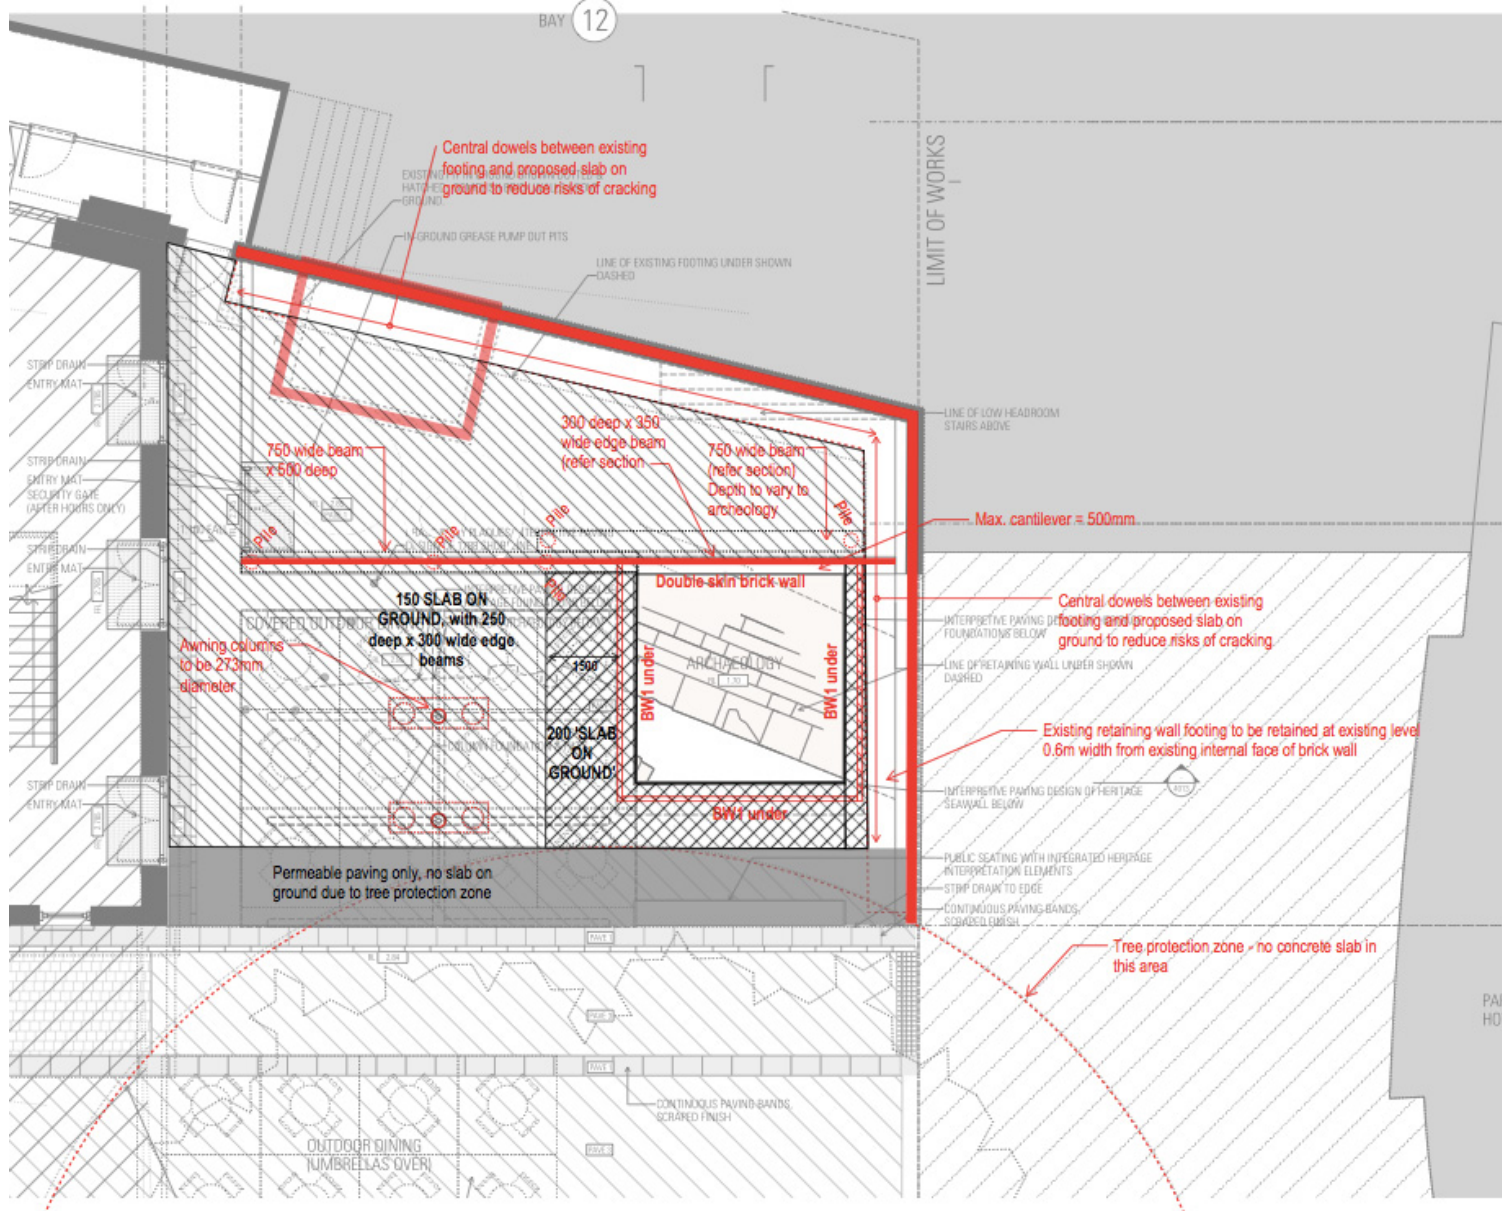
Level 1 plan showing details of concrete floor and edge beams to toilets and slabs on ground over backfilled archaeology. Note north is to rhs of page. (Source: TTW 180228_Bay 12_Archaeology S96_TTW Structure)
